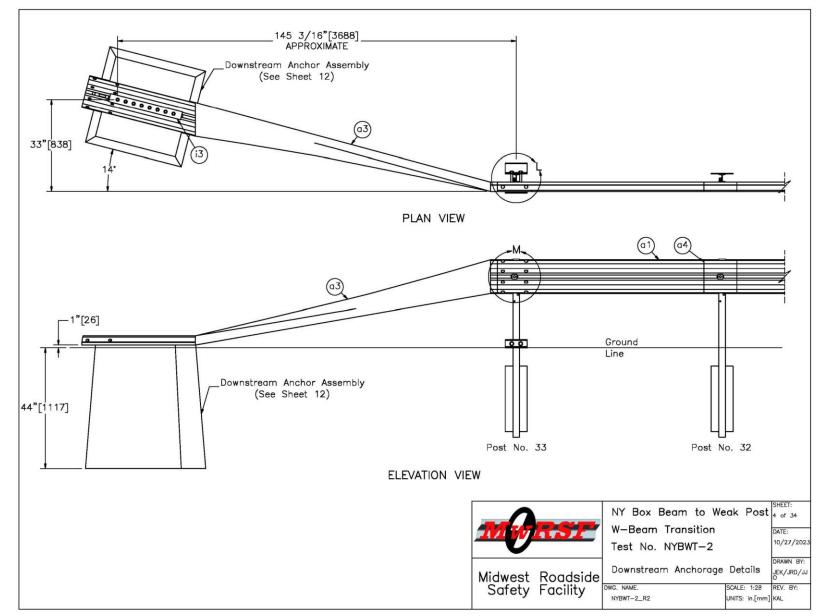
Downstream Anchorage Details, Test No. NYBWT-2
